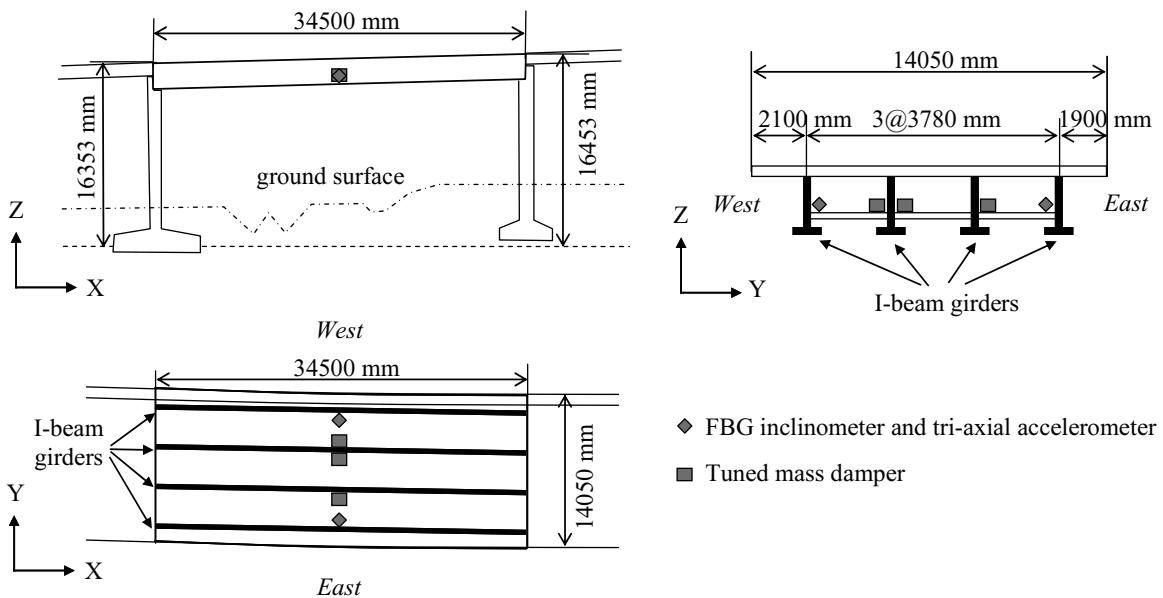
Arrangement of sensors and tuned mass dampers on target bridge.
